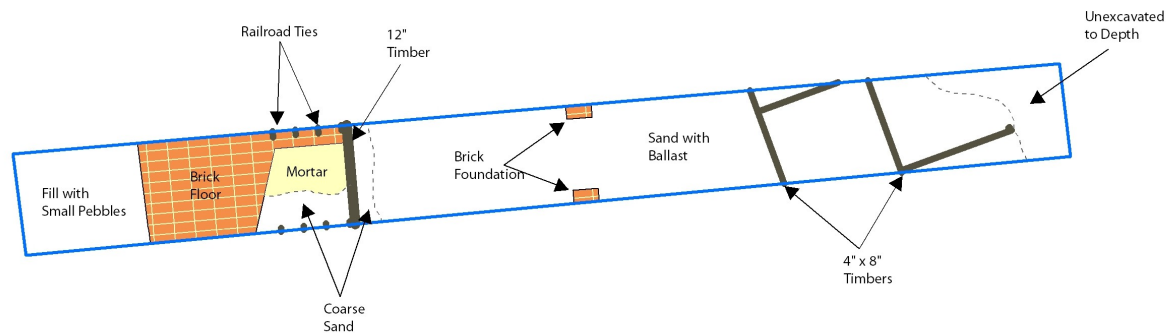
Trench 1- Inspecting 1795 Storehouse Floor
